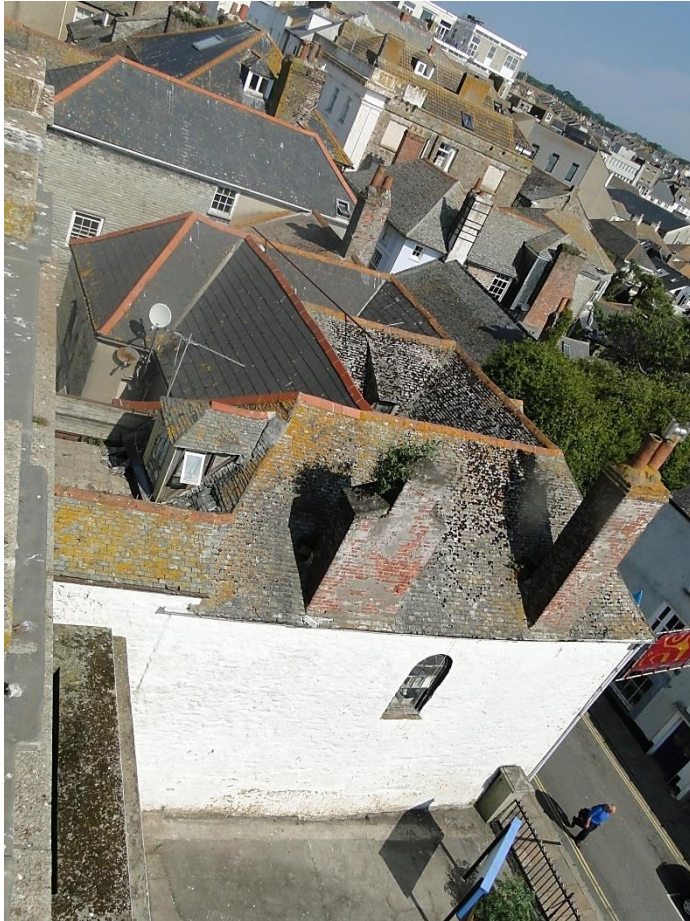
Roof structure of the house looking north-west (taken in 2013) © David Scott, Scott & Co.
